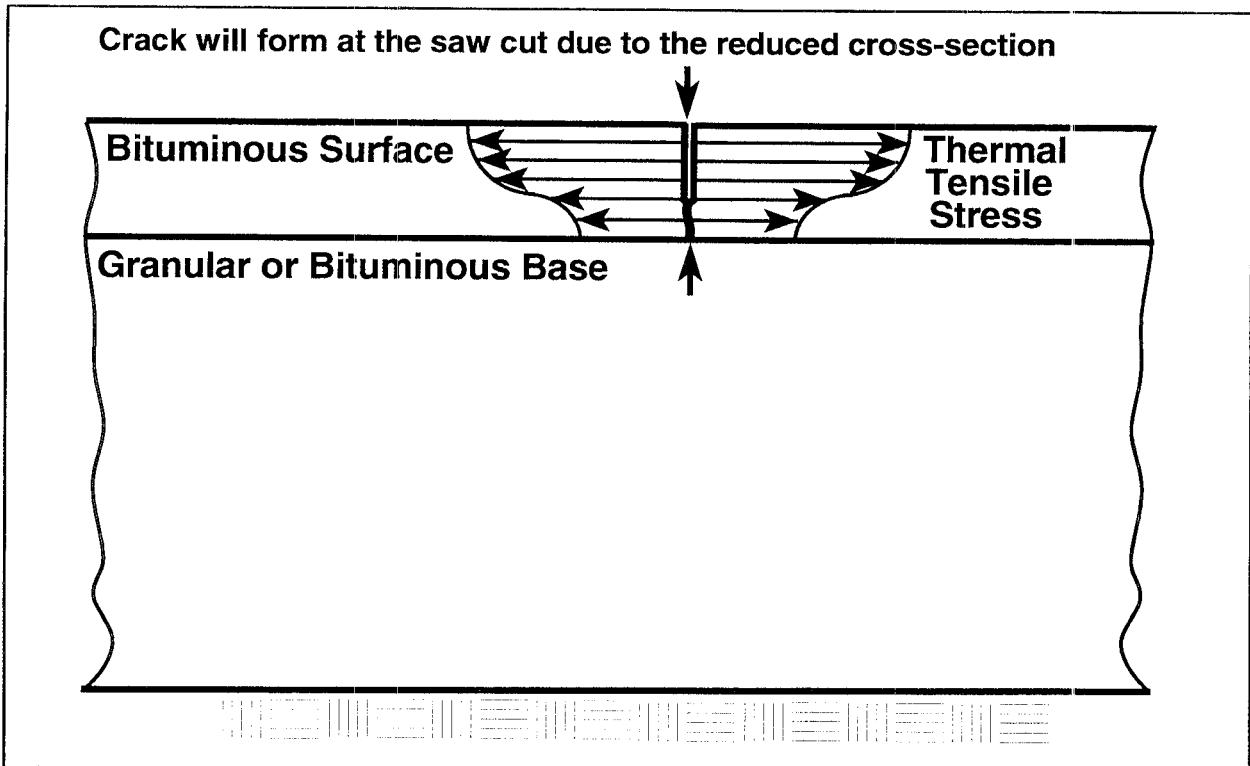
Thermal stresses will cause pavement to crack at the sawed joint.
